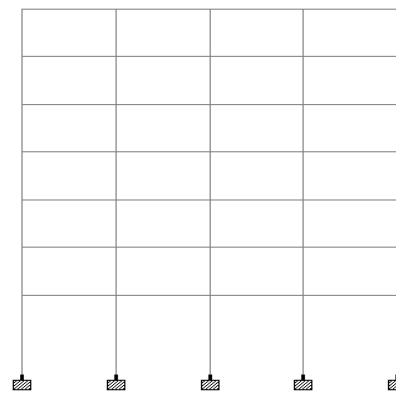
elevation view of building with soft story at bottom in STAAD.Pro
